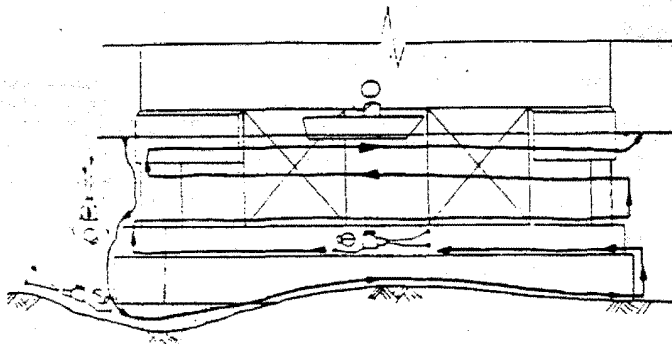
Schematic representation of a diver inspecting a pier
